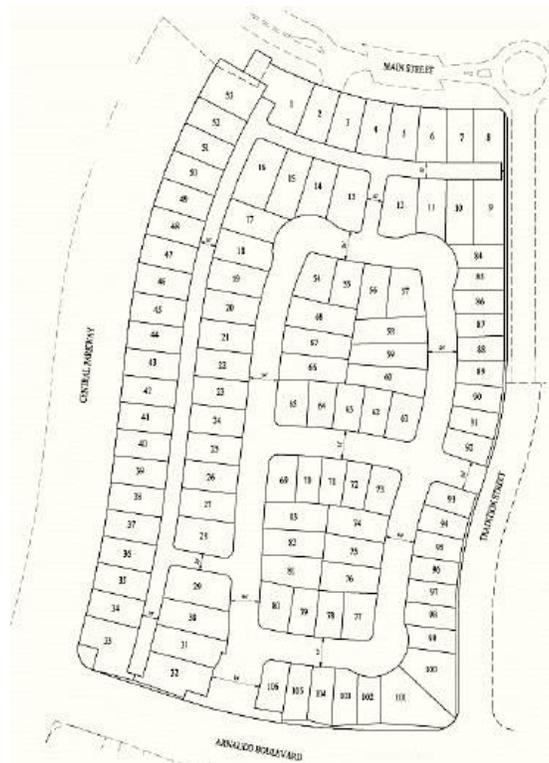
Access for Parcel @ Arnaudo Blvd & Central Parkway
